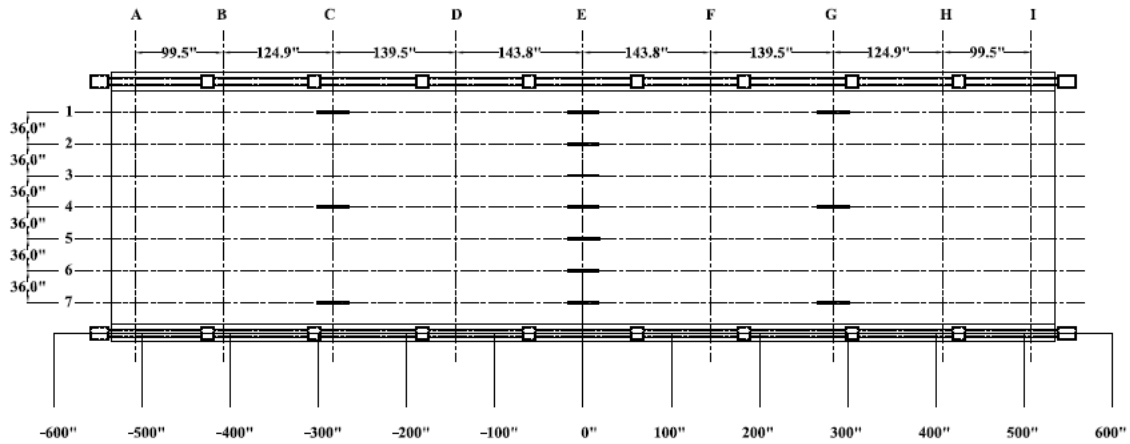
Layout of Longitudinal Steel Strain Gages where Line 1 is Upstream (1 inch = 2.54cm)
